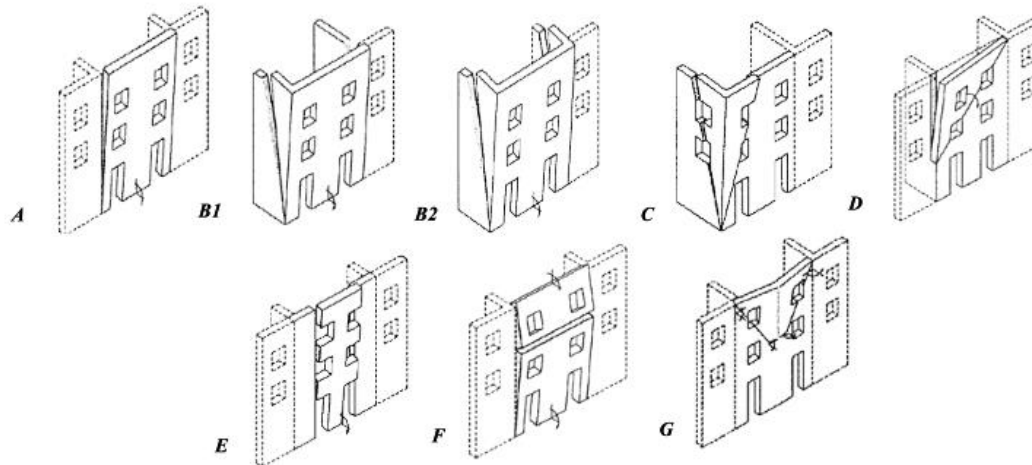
Examples of out-of-plane failure mechanisms [2]
